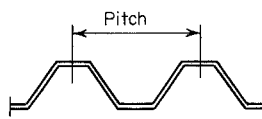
Cross section of typical trapezoidal-type corrugated sheets.
